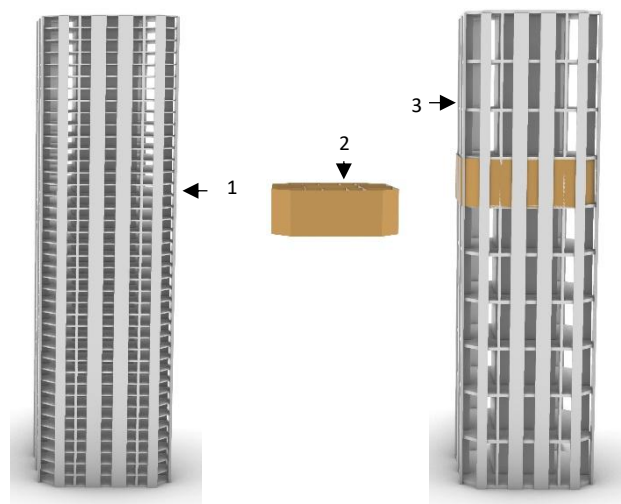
the initial concrete frame system building and the proposed hybrid timber-concrete system, 1. Initial building, 2. Proposed CLT part, 3. The proposed building
